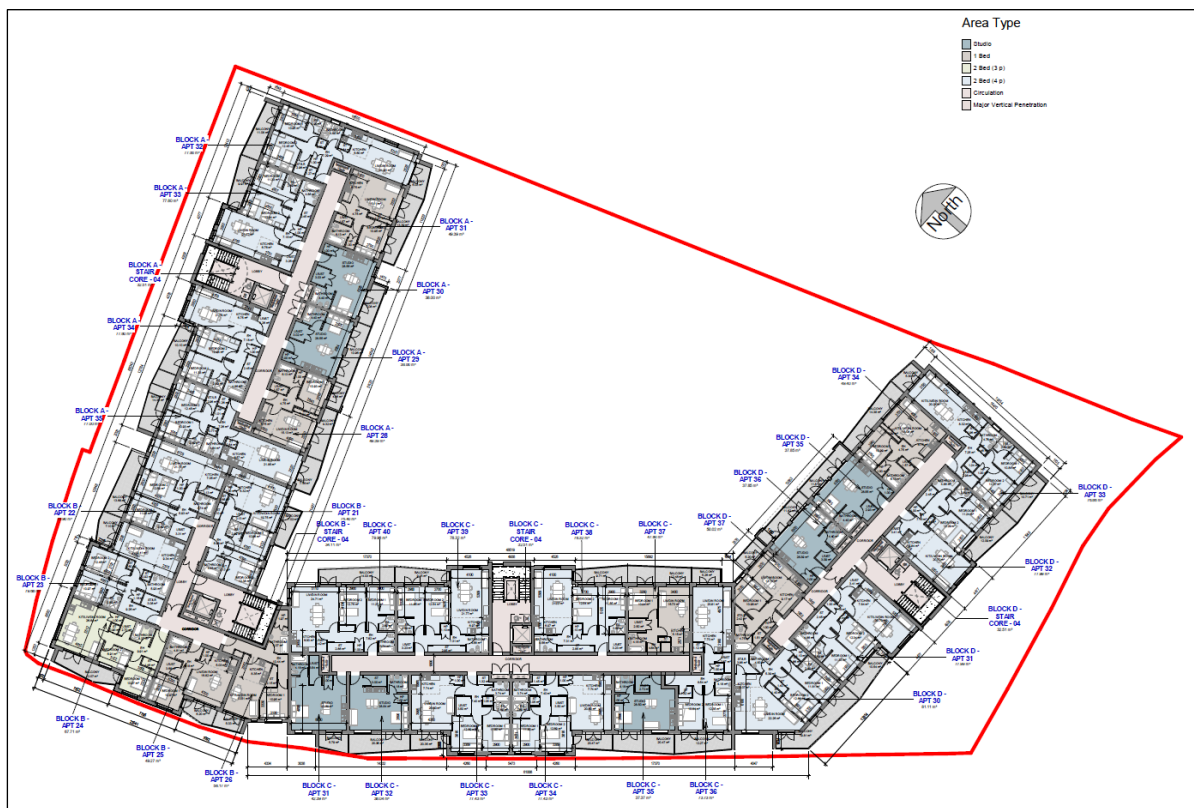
Fourth floor plan of development approved under ABP Ref. No. 303803-19
